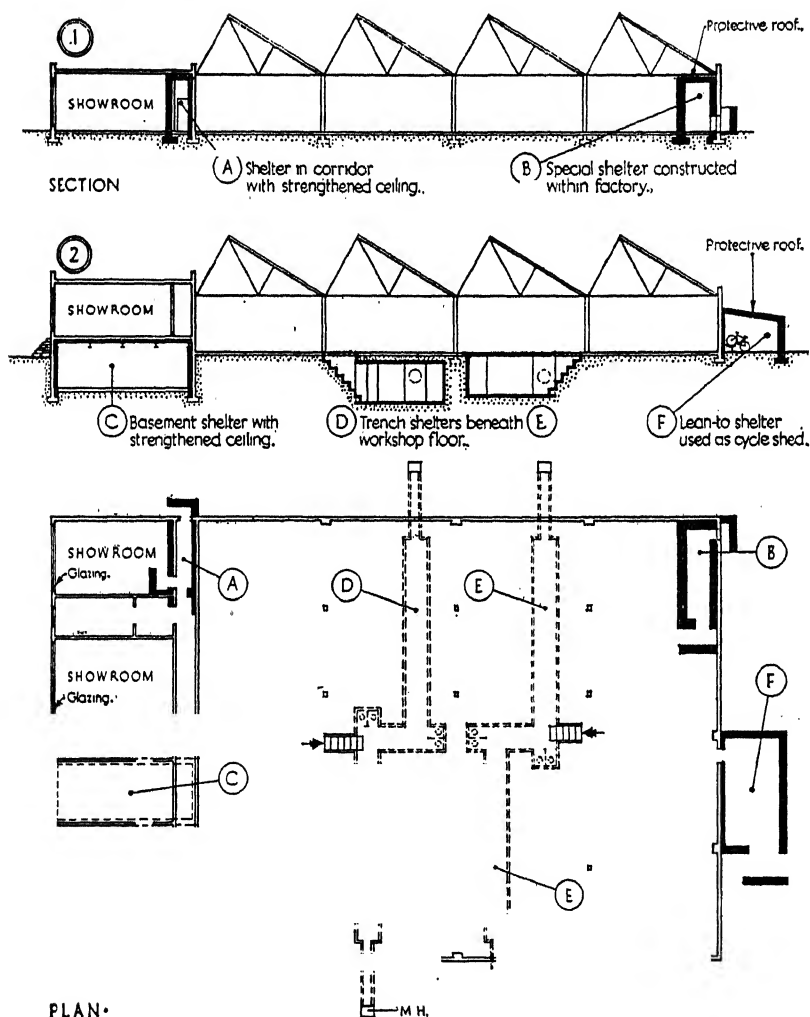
Suggestions for the provision of shelters in single-storey factory buildings.
